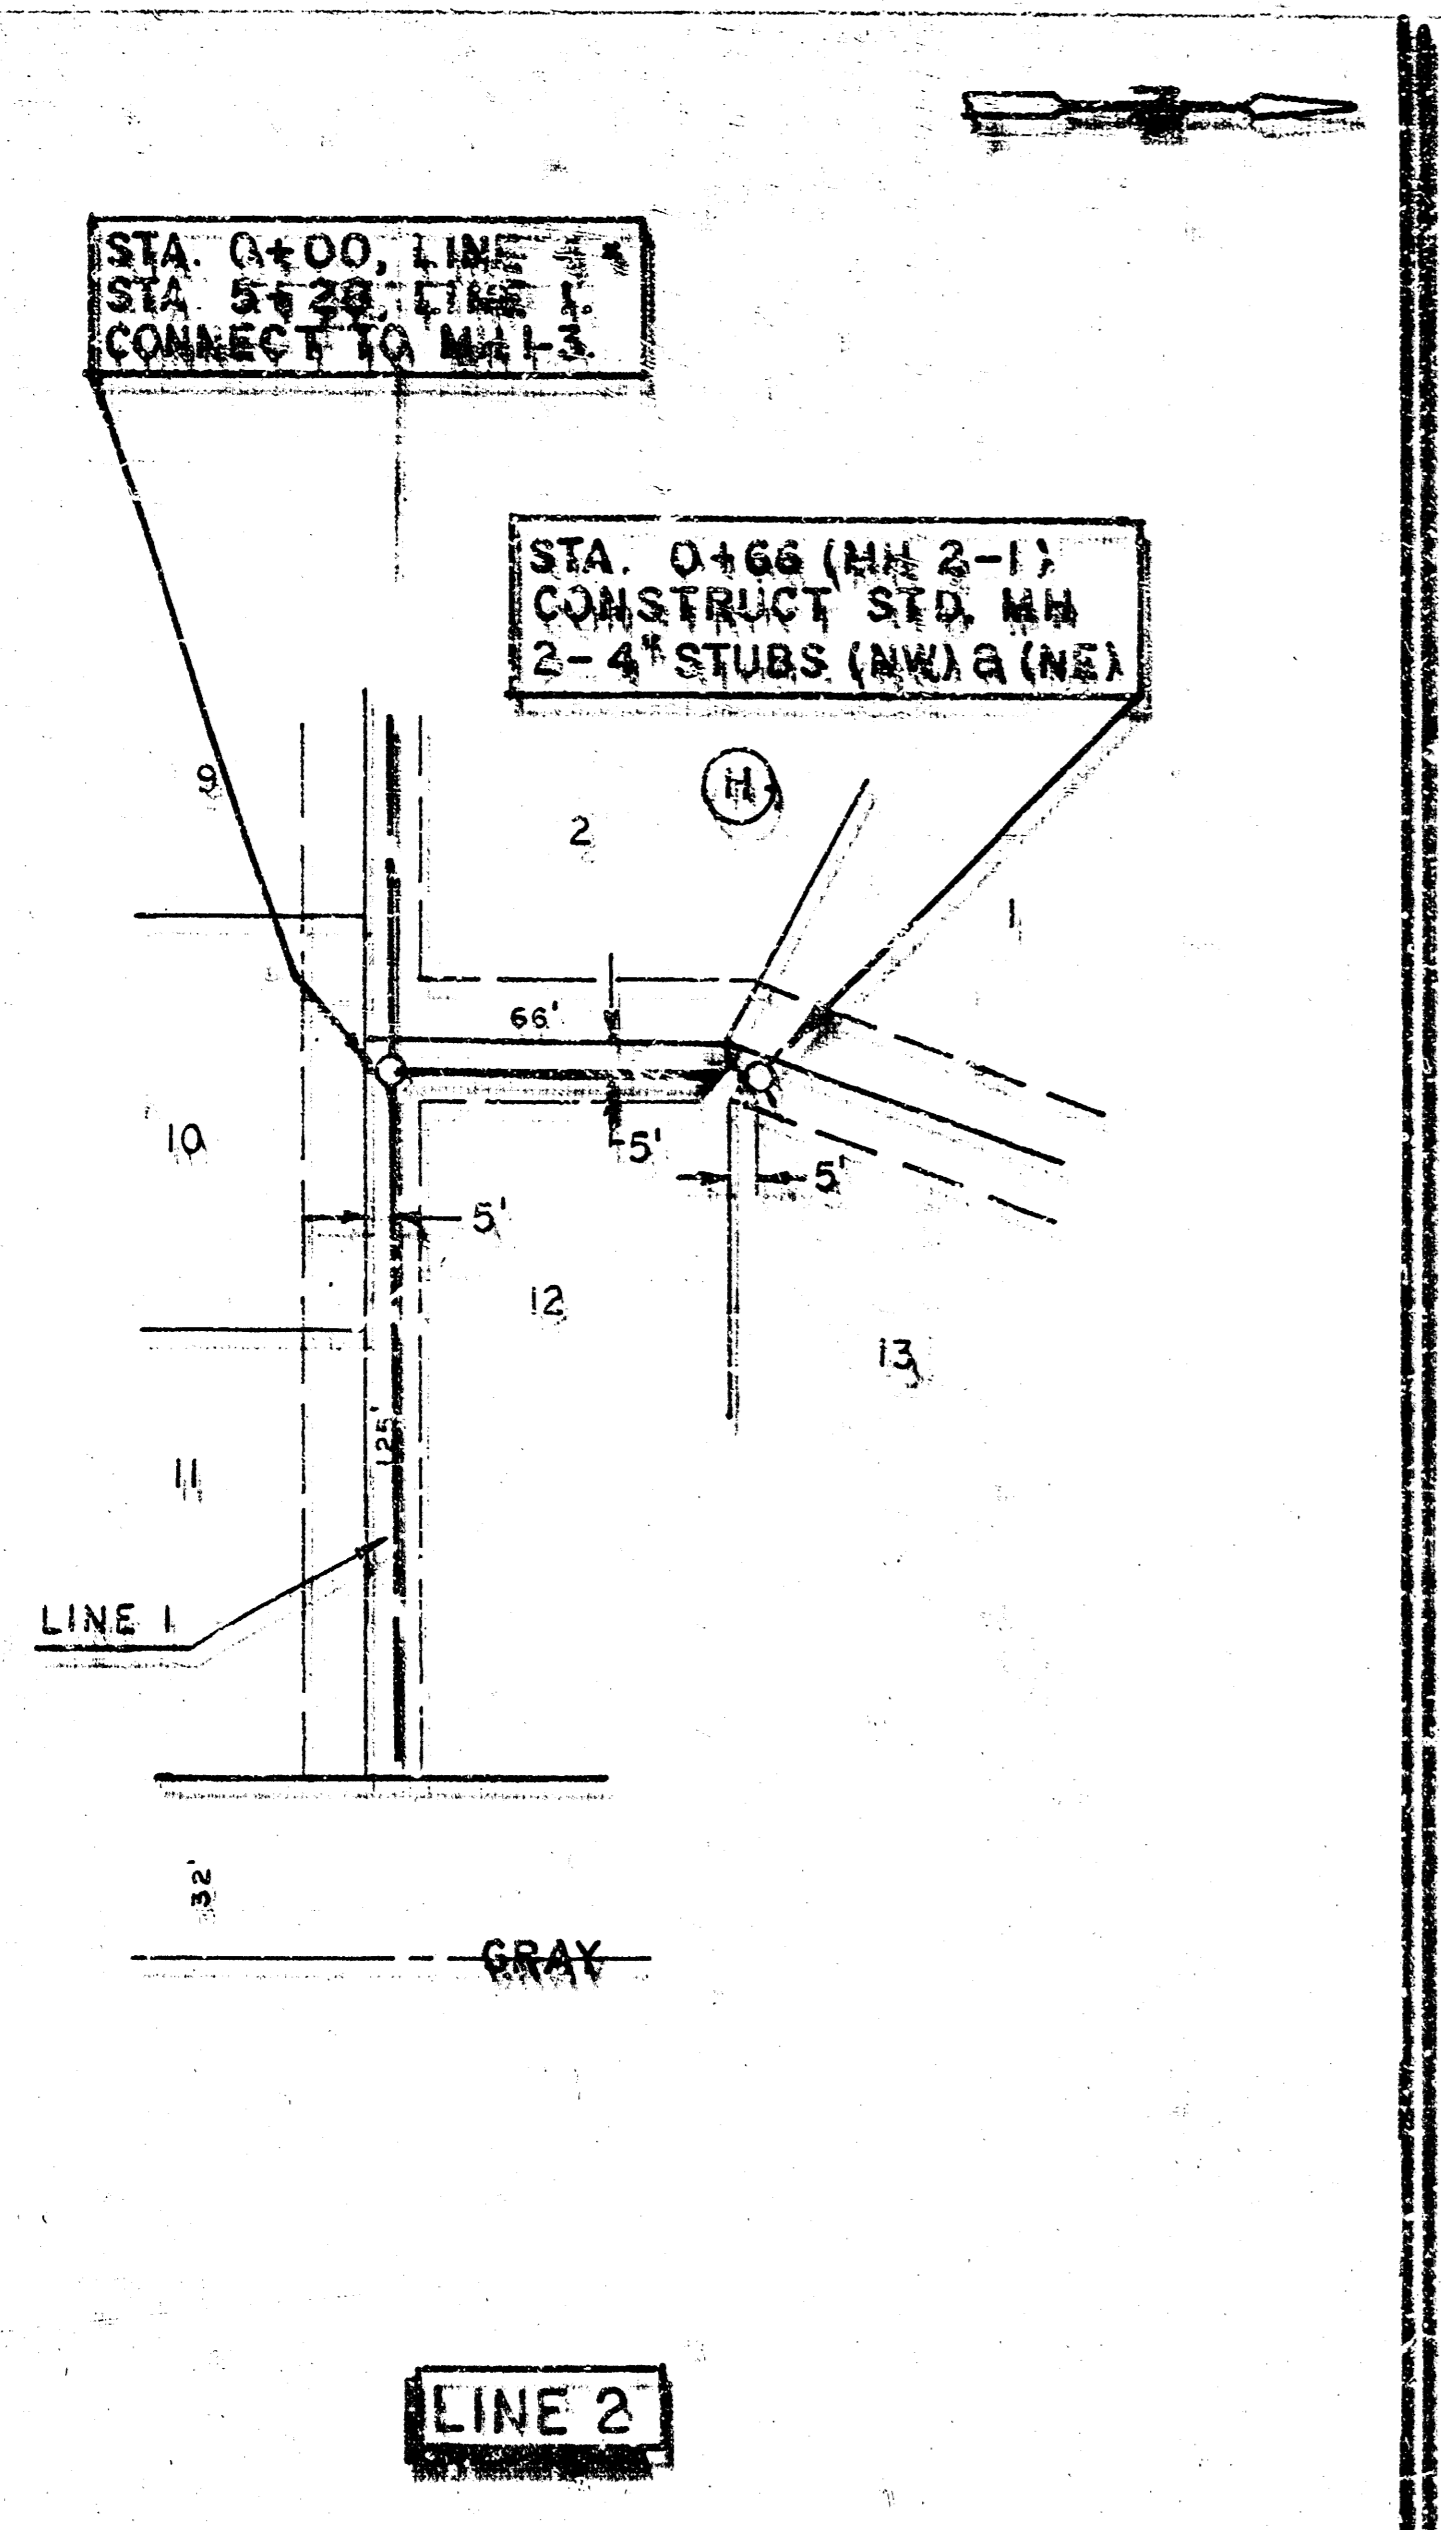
SINGLE PLAN AND PROFILE PULLING
